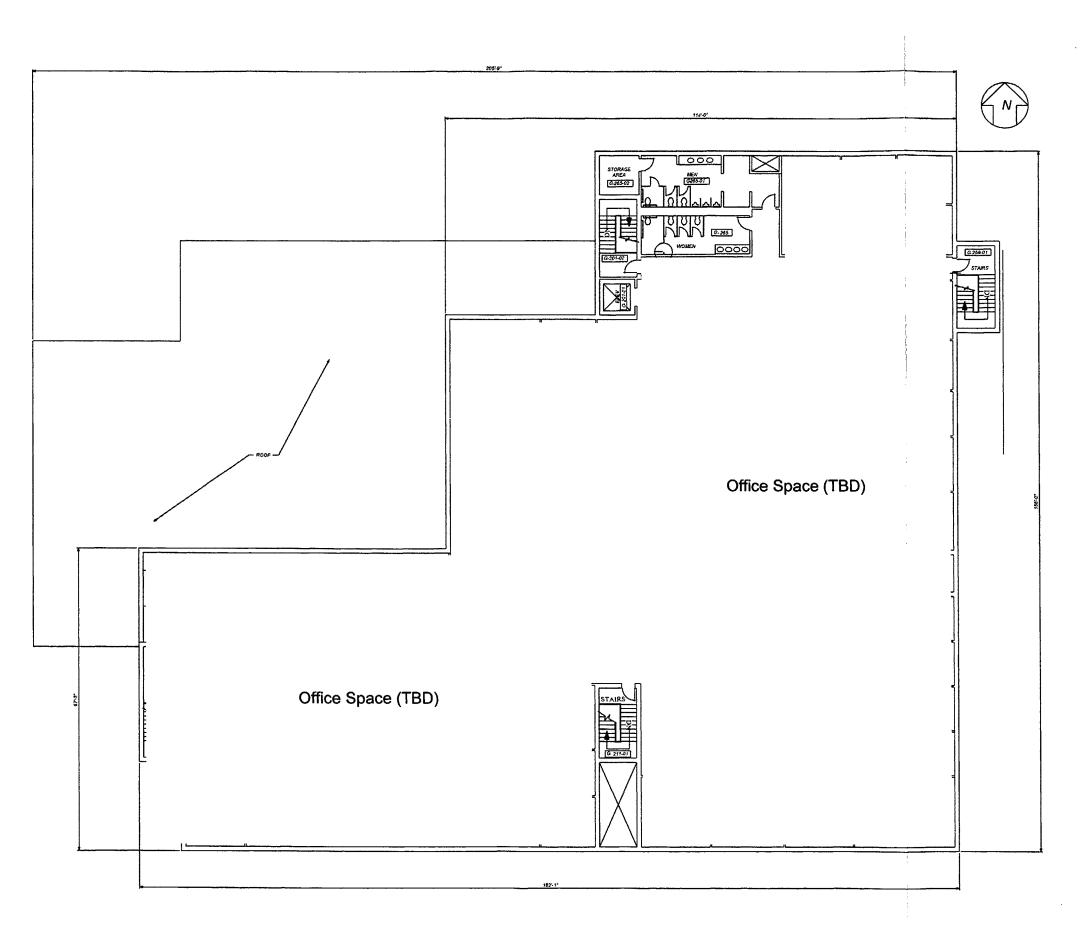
General Arrangement - Technical Support Building (BTS) Conceptual Layout - First Floor
